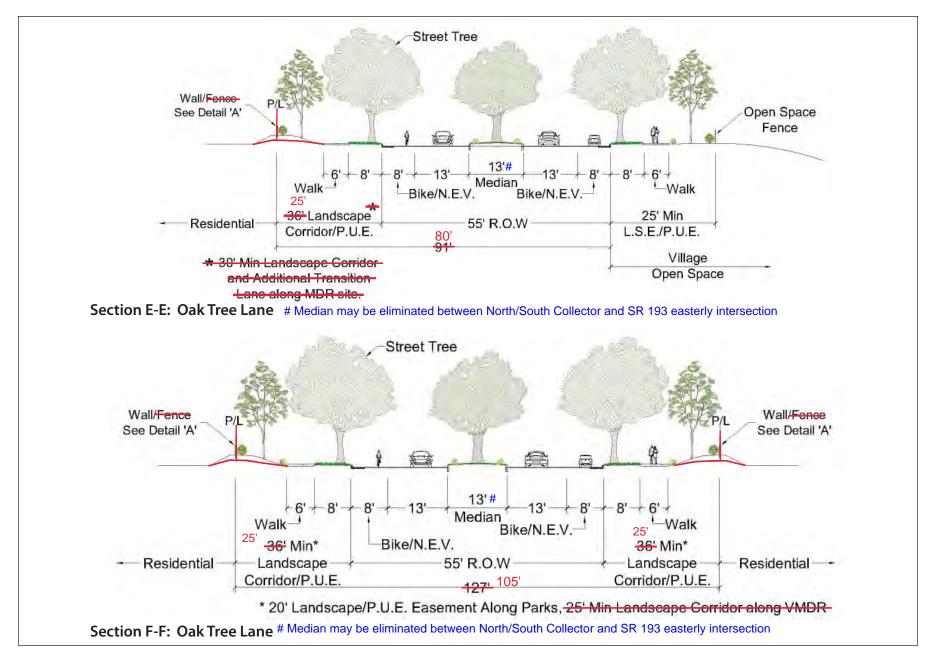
Minor Arterial Street Cross Sections - Oak Tree Lane
